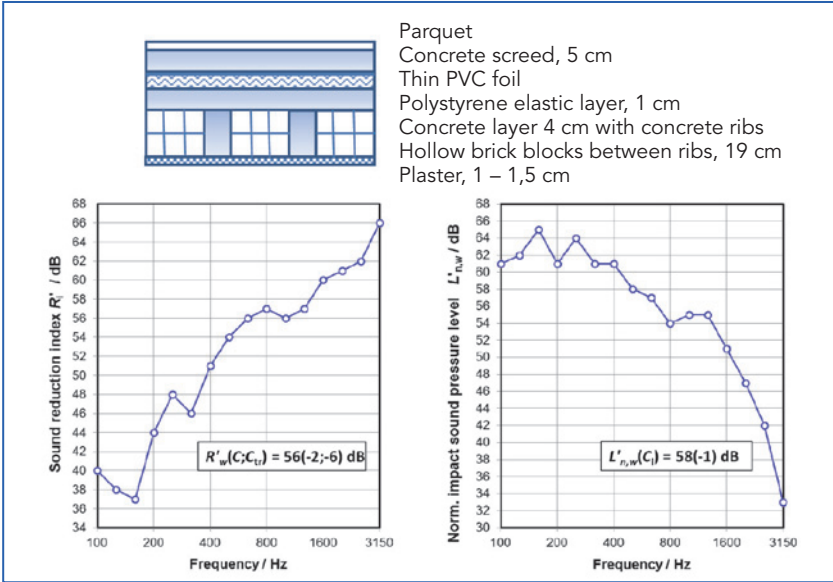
Case study: sound insulation performance of typical floor construction with hollow bricks.
